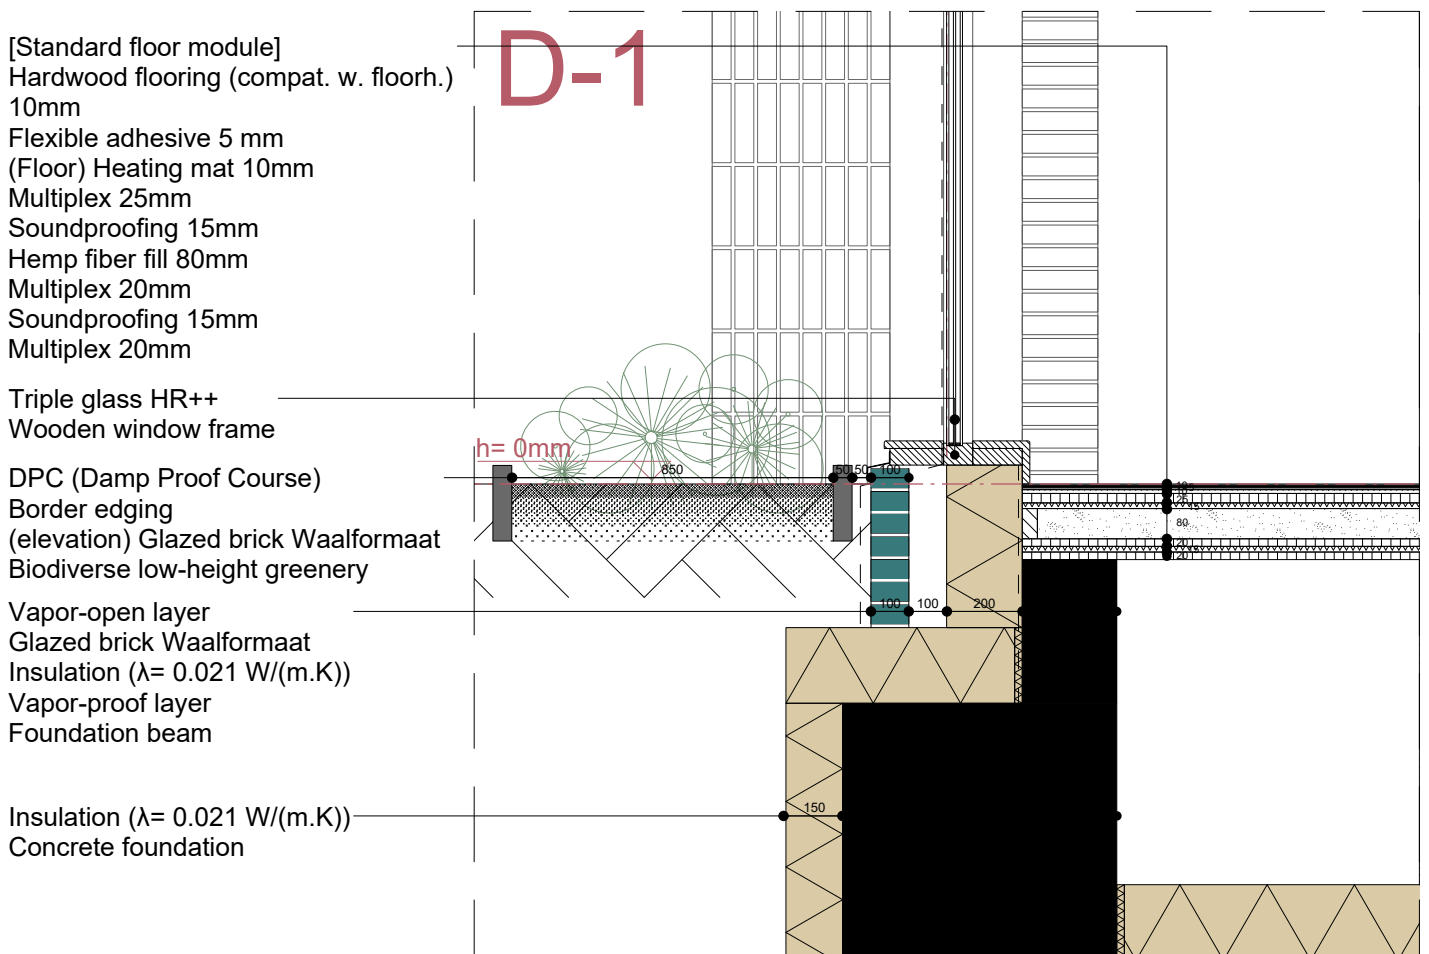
detail D-1, ground floor and foundation (scale 1:20)
